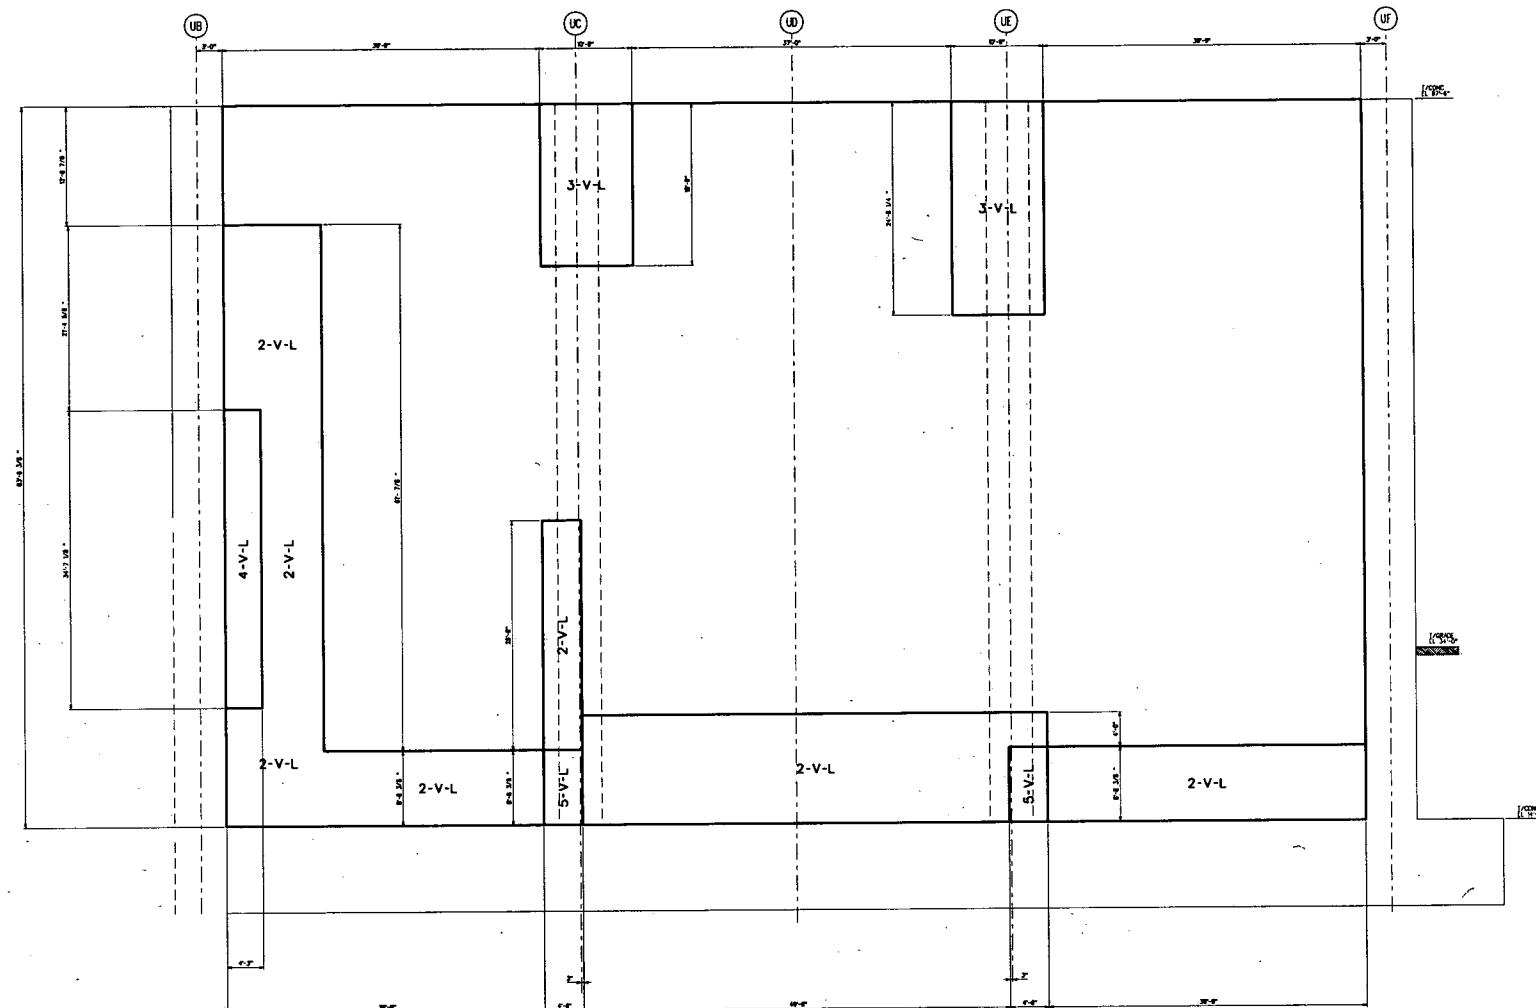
BASIN WEST WALL LOOKING EAST
